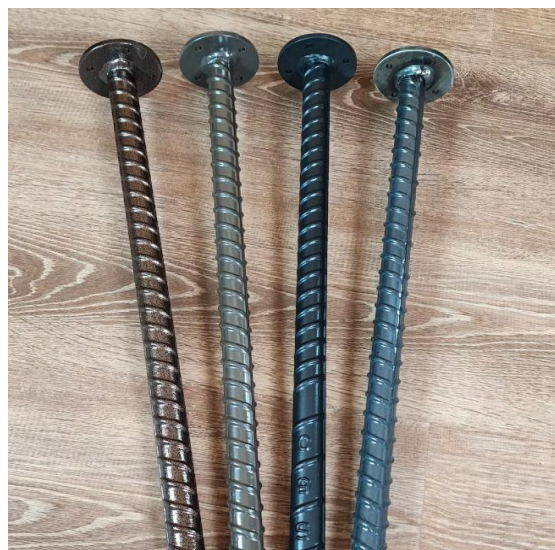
Proposed rebar configuration with welded "nail head" plate.
